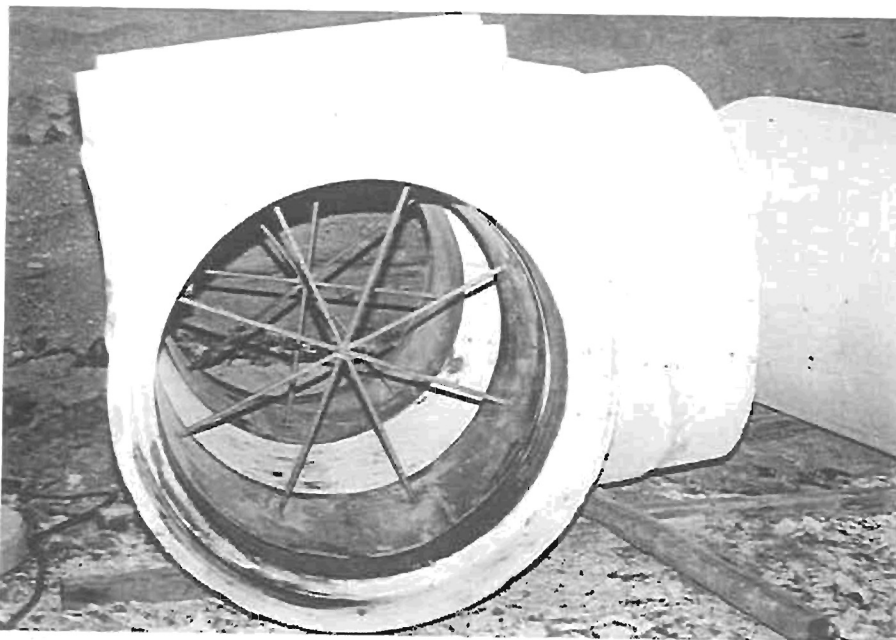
This particular Type "T" manhole is a three way design. The rebar in the center is used for support during transit, and is removed after installation.
